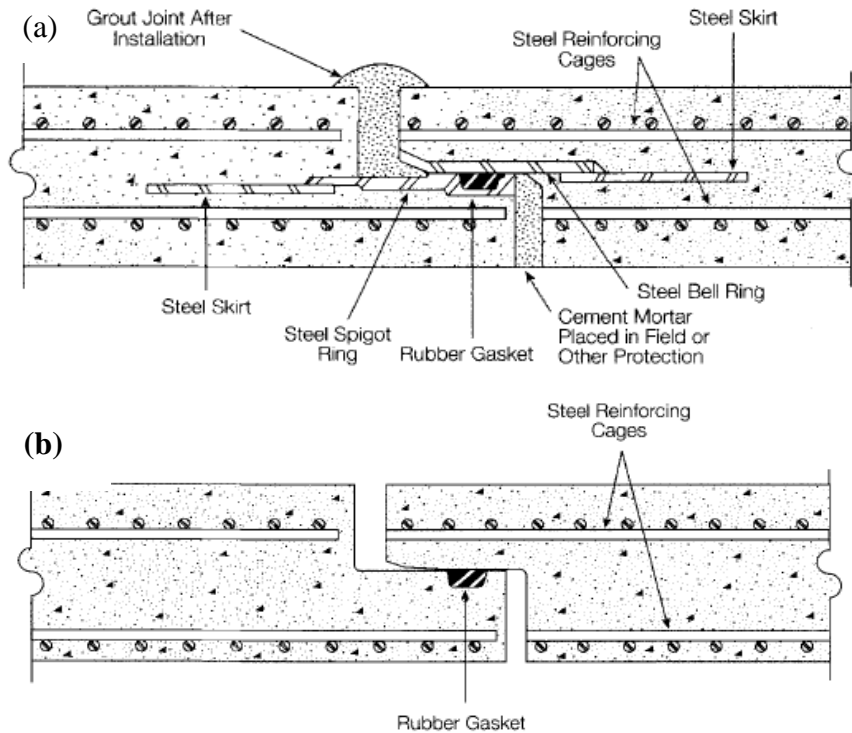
Reinforced concrete non-cylinder pipelines: a) Pipe with Steel Joint Rings and b) Pipe with Concrete Joint Rings. Reproduced from [4].
